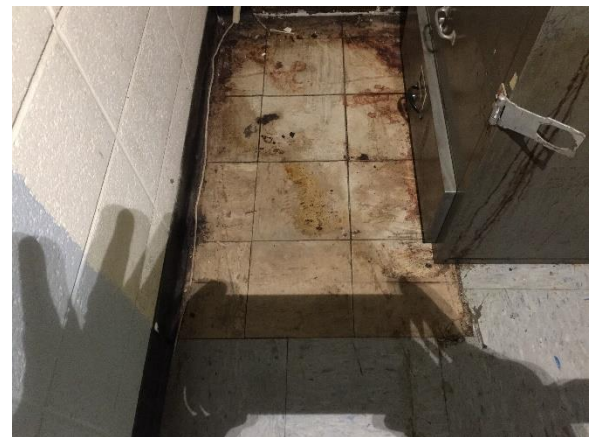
Example view of asbestos-containing 9x9 VCT and black mastic, office area, Warehouse #4 (Building 4).
